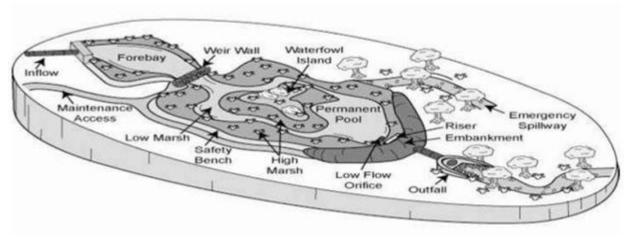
Typical plan view of a constructed wetland system (VADCR 2011)
